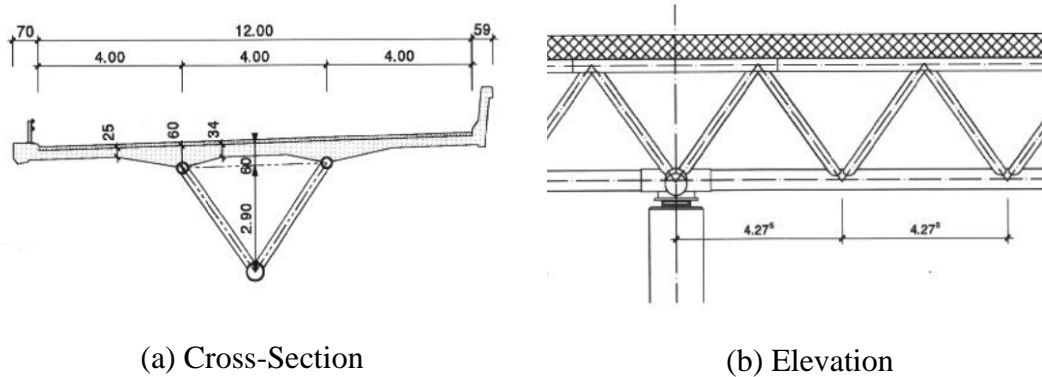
Lully Viaduct (a) Cross-Section and (b) Elevation View, SI Dimensions (Dauner et al. 1998)
